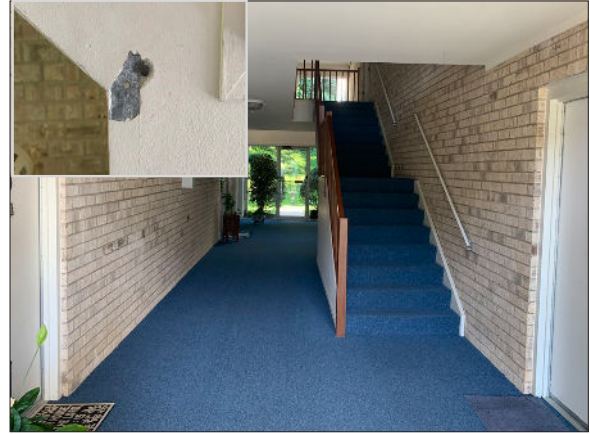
Typical building interior. Note the example of damaged drywall by the stairwell.
